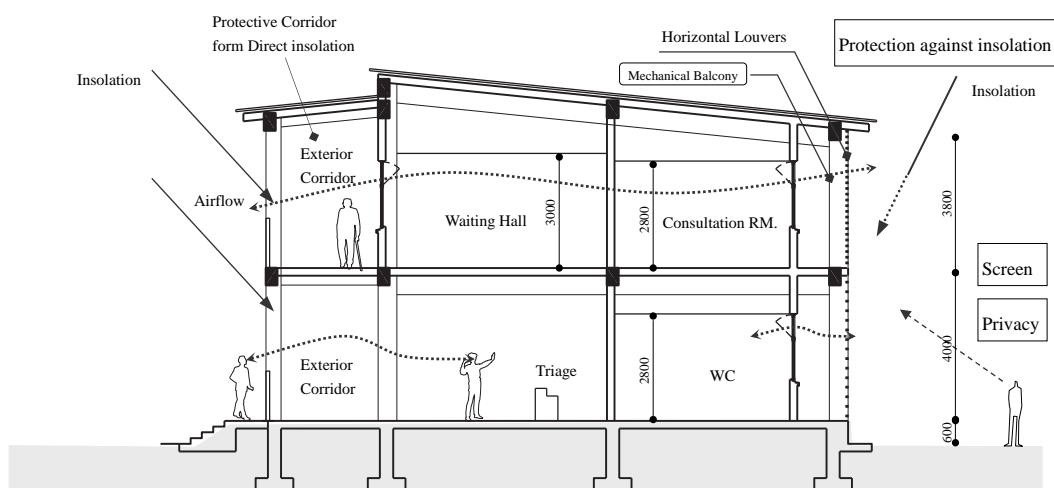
Chawama Lv1H Cross-section of Outpatient Department
